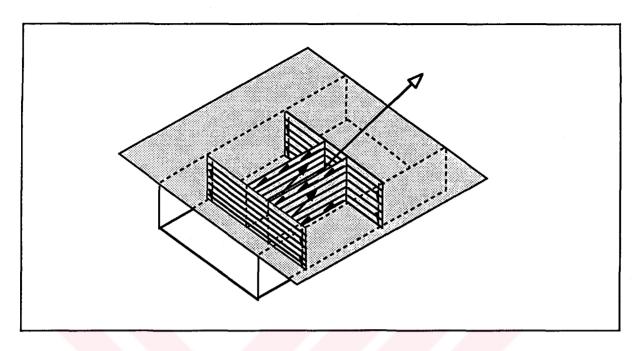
CONNECTION BETWEEN A LARGE MULTI-STRAND STAY CABLE AND A WIDE MONO-CELLULAR STIFFENING GIRDER
